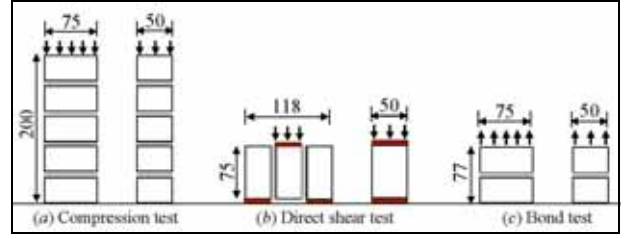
Layout of specimens used for direct compression, direct shear and bond test (unit:mm)
